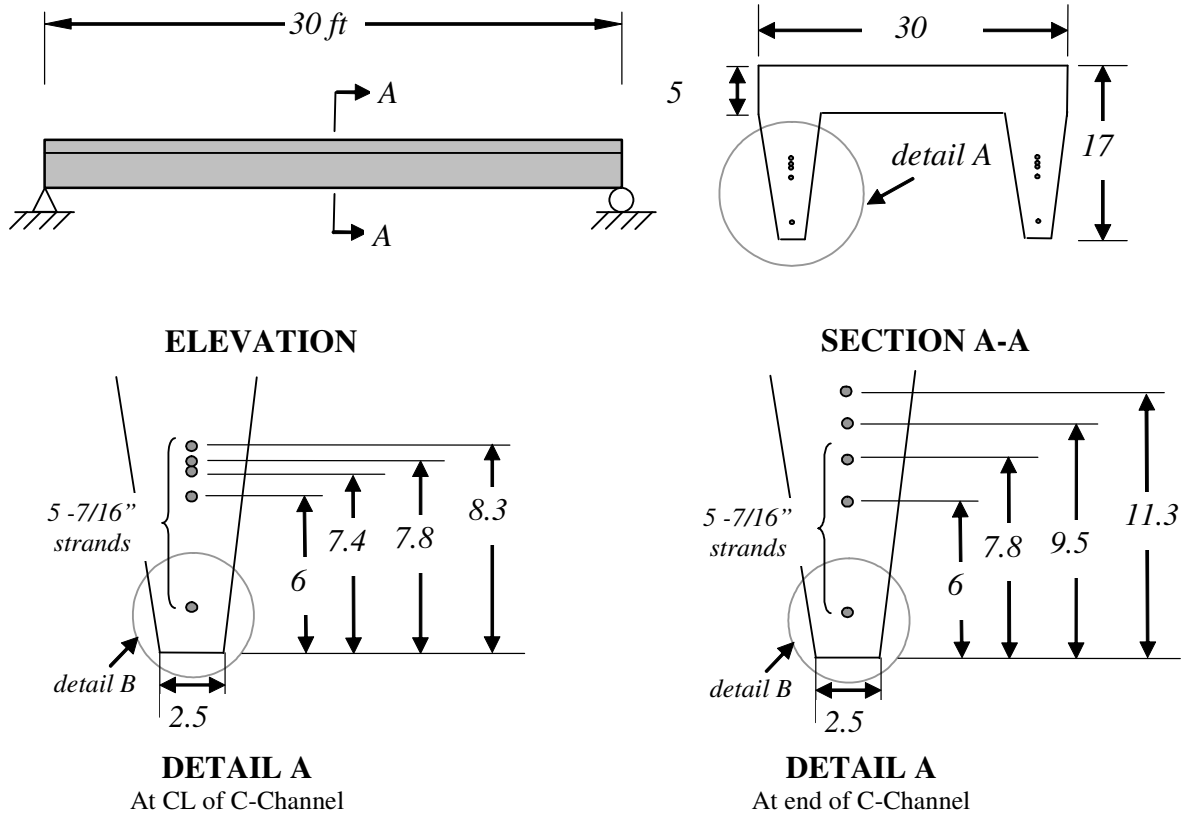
Elevation and cross section of C-Channel girder to be strengthened with CFRP (in inches)
